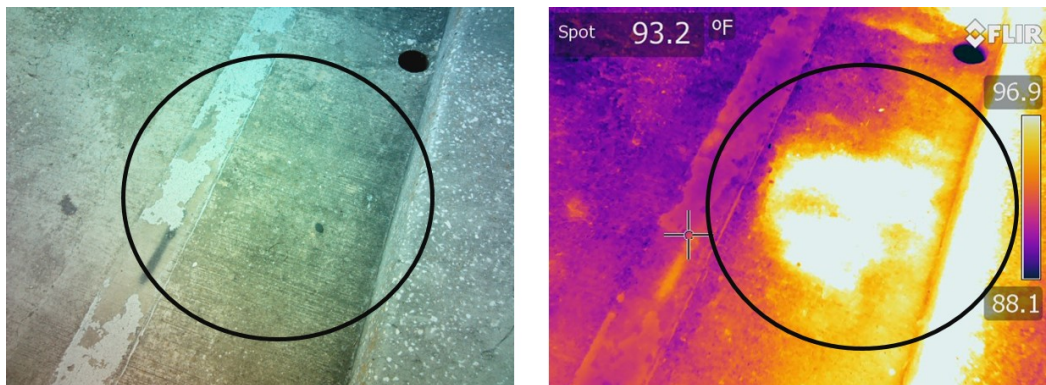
Photograph (left) and thermal image (right) revealing a subsurface defect in a bridge deck.
